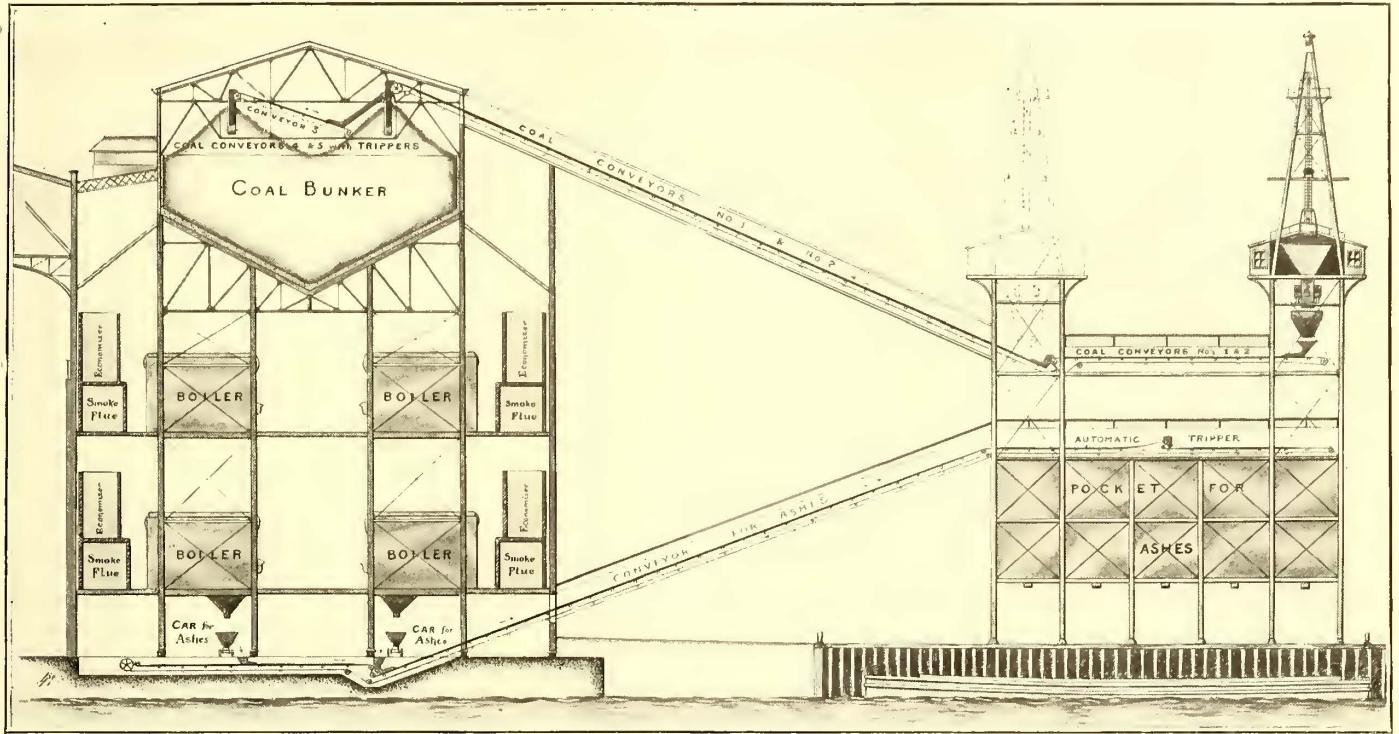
HANDLING COAL AND ASHES AT THIRD AVENUE RAILWAY PLANT, NEW YORK
